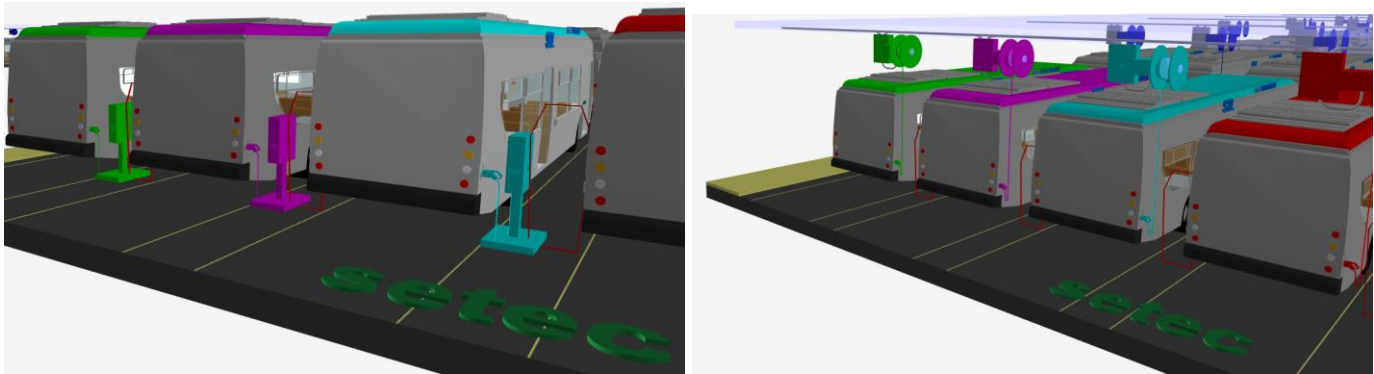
Stacked parking layout - rear positioning of charger (left) and aerial configuration (right) - STL electric bus network in Laval, Canada (BIM modeling by setec)
